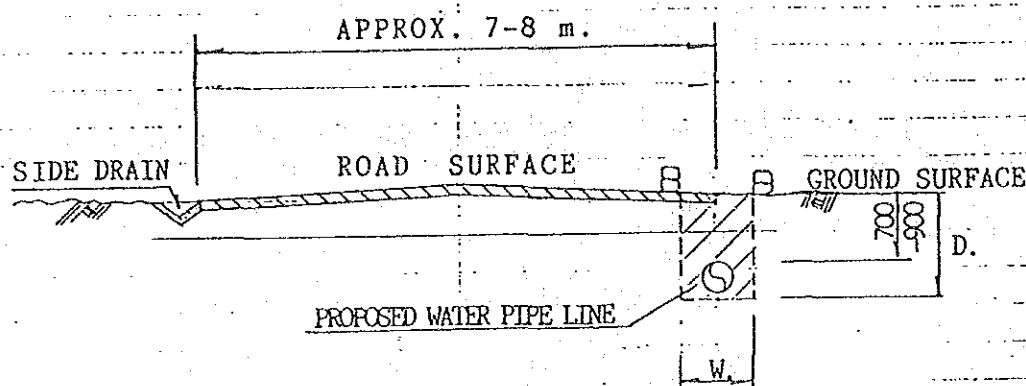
TYPICAL CROSS SECTION OF PIPE IN CAUSEWAY
